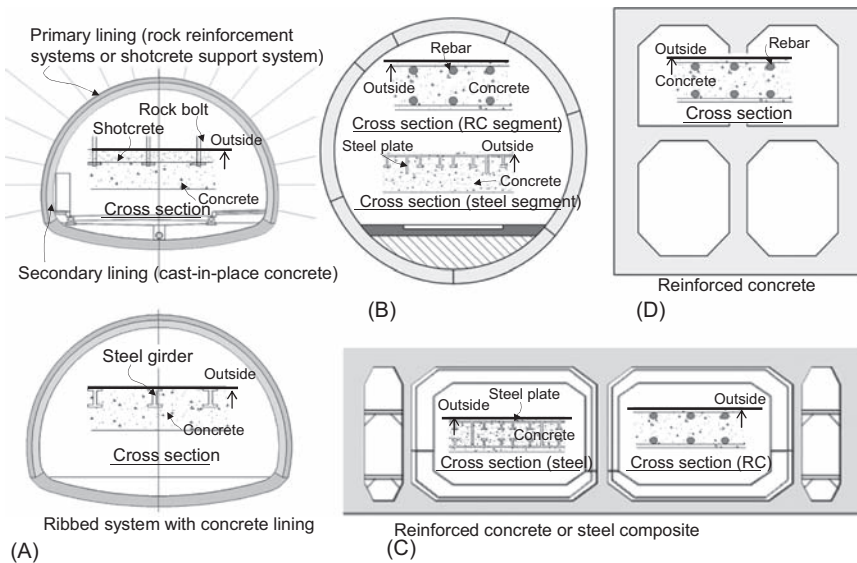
Support system and composition: (A) NATM or rock tunnel, (B) shield tunnel, (C) immersed tube tunnel, and (D) cut and cover tunnel.
